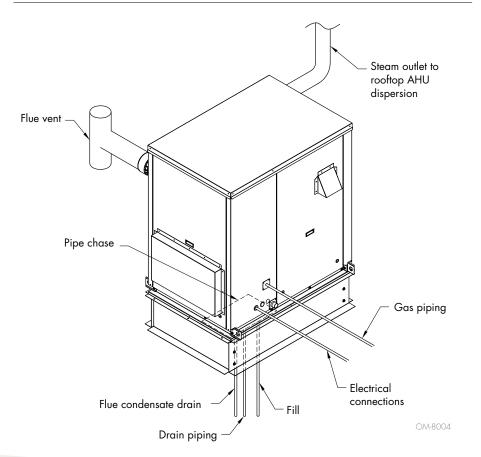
OUTDOOR ENCLOSURE TYPICAL INSTALLATION OVERVIEW
